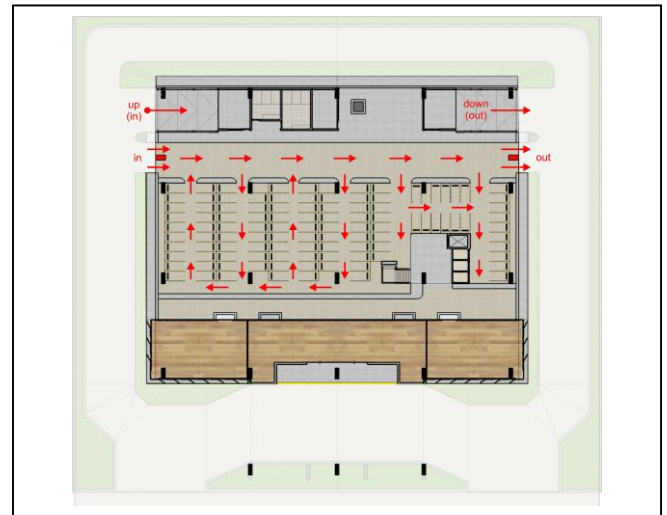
Internal circulation pattern of Park & Ride building (ground floor)
